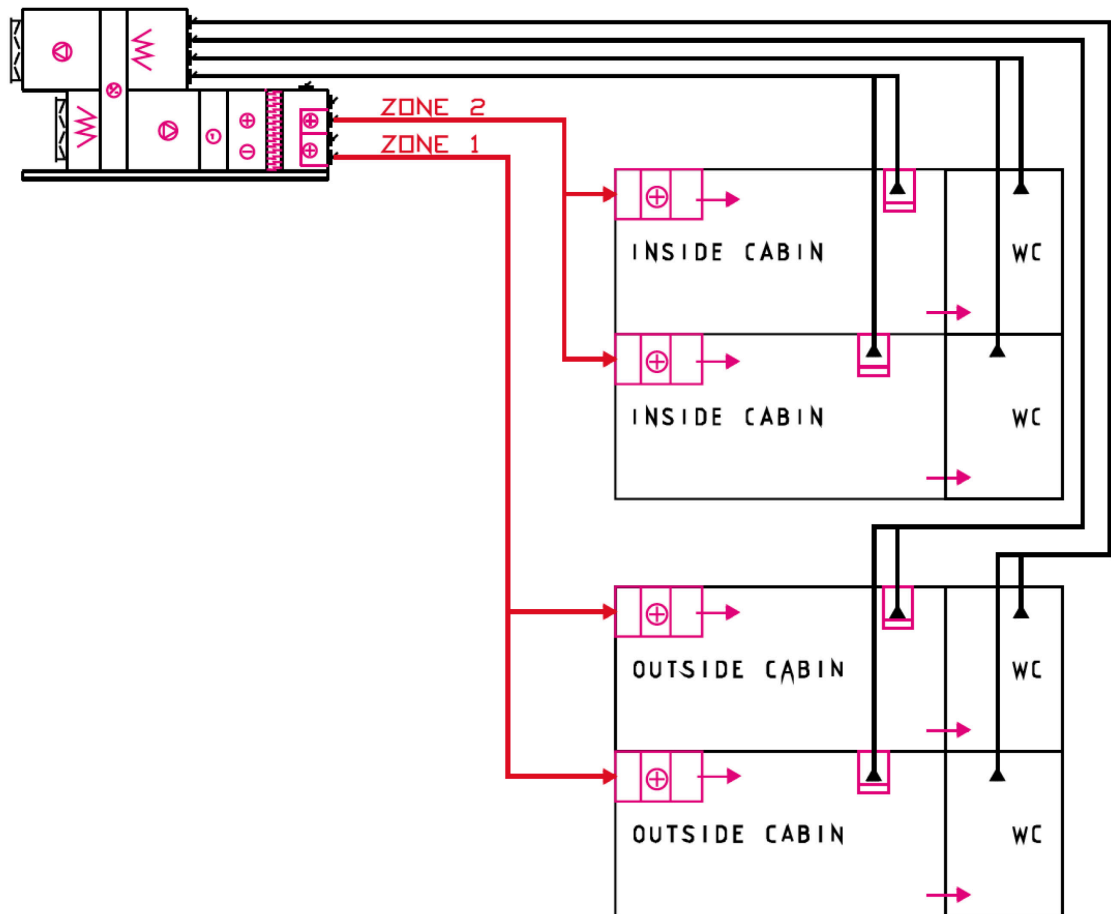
Structure and working principle of the ventilation system (Meyer 2016).
